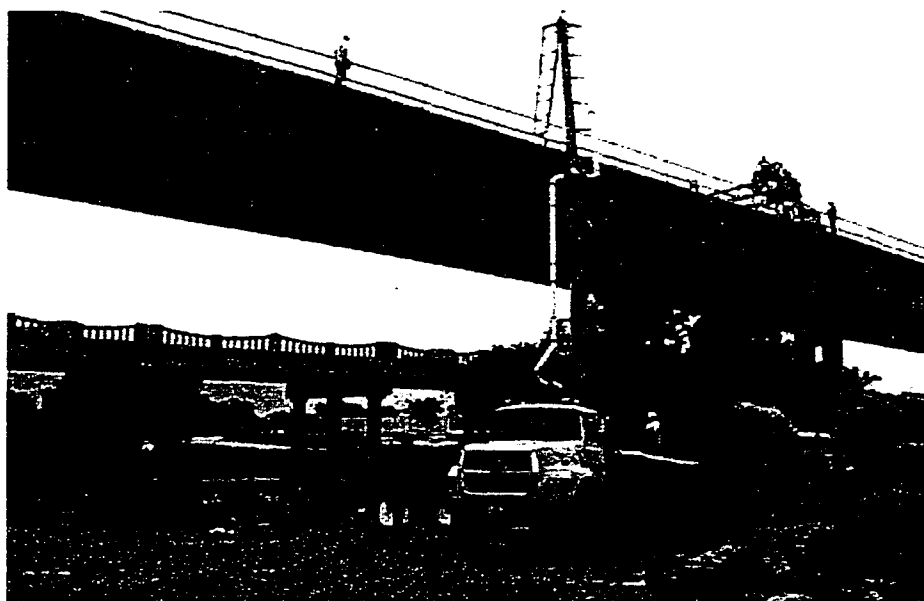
Pumping of Concrete During Deck Pour in the Eastbound Bridge
